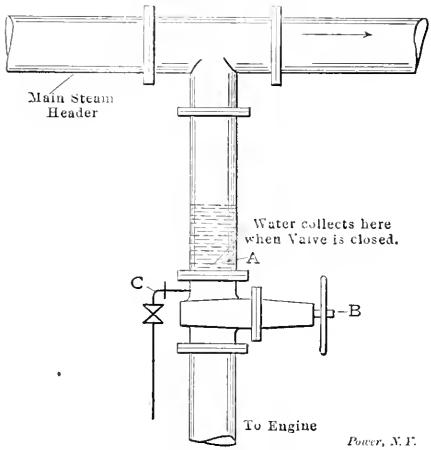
WHEN STEAM IS TAKEN FROM BOTTOM OF HEADER
